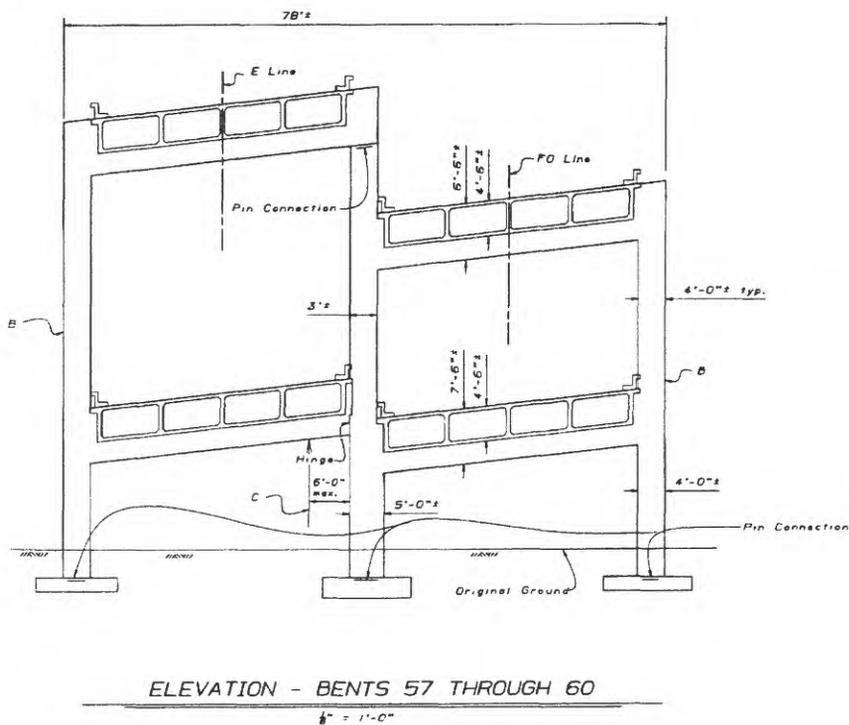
Elevation drawing of Bents 57 to 60 at Embarcadero Viaduct
